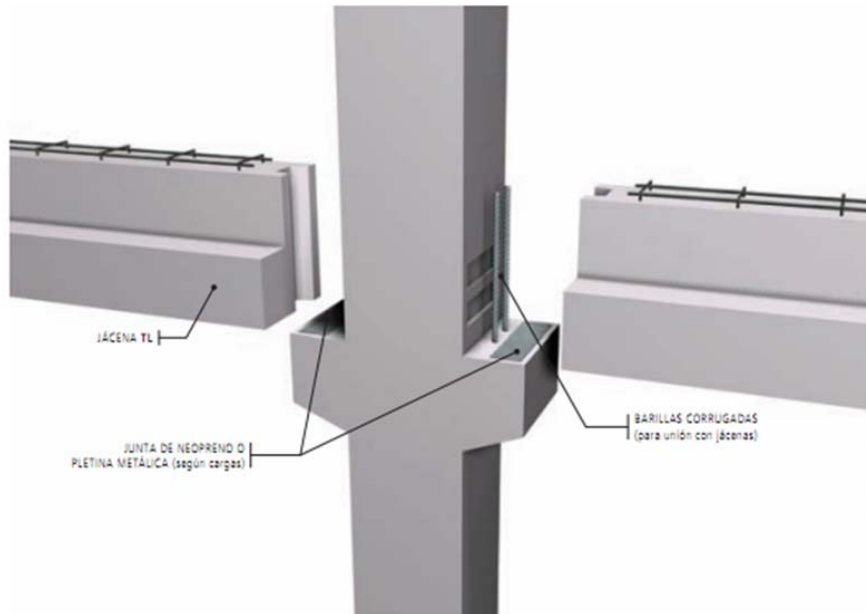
Precast concrete column with corbel for girder connection (with neoprene bearing pads and steel bars for connection)
